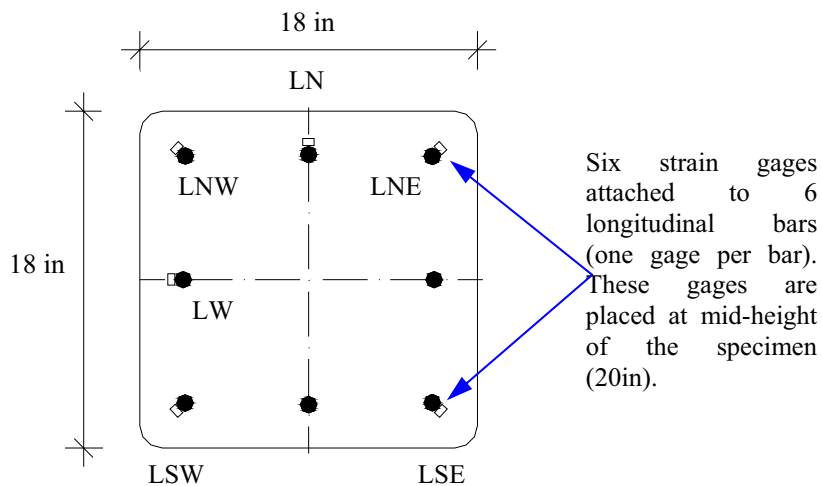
Section B-B; Strain Gages Location on Longitudinal Steel; Specimens C1, C2 & C3
